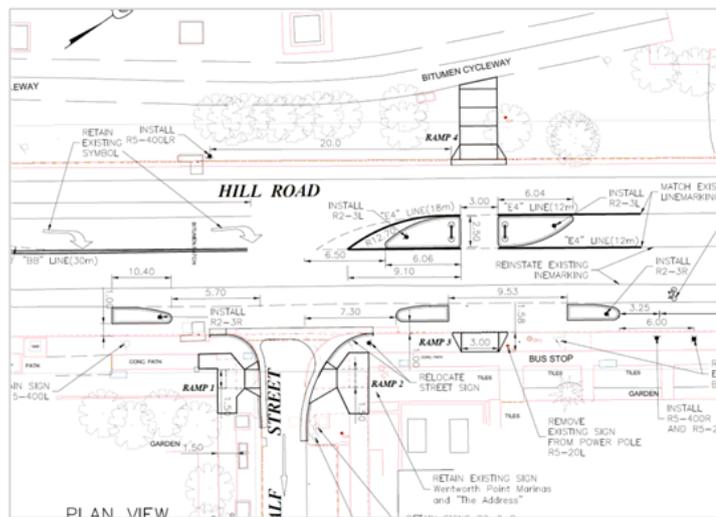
The final design plan of the approved pedestrian refuge island in Hill Road north of Half Street, Wentworth Point
